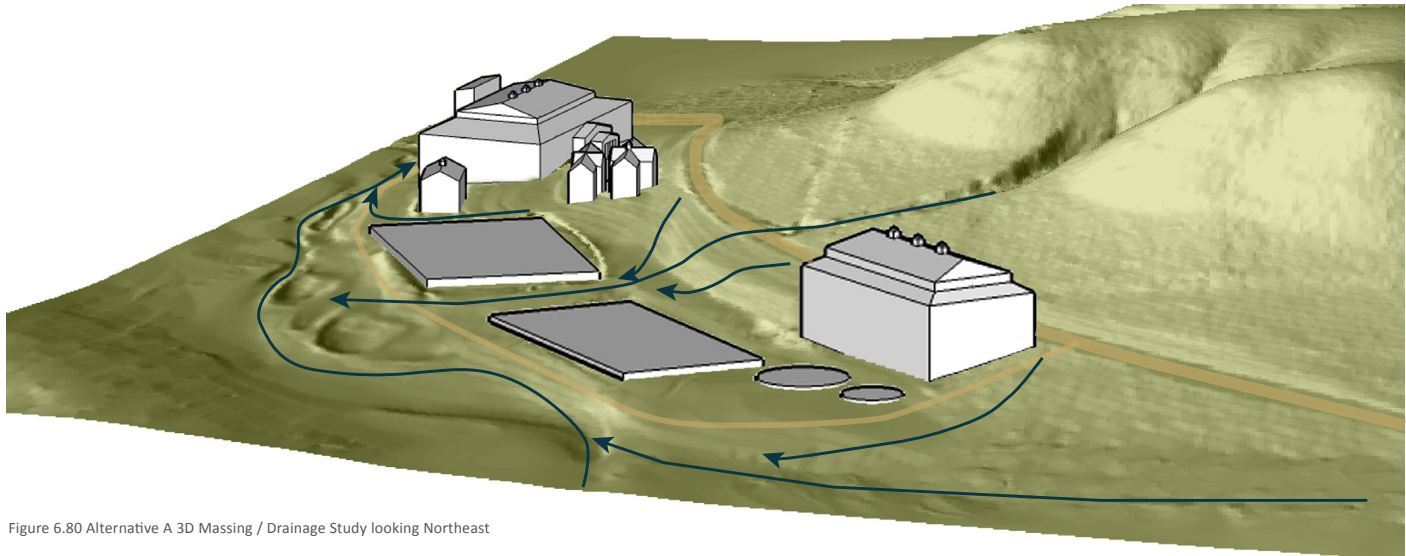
Alternative A 3D Massing / Drainage Study looking Northeast
